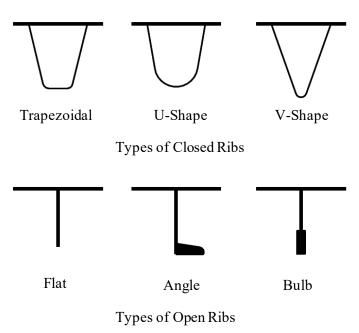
Common Rib Types for Orthotropic Steel Decks.
